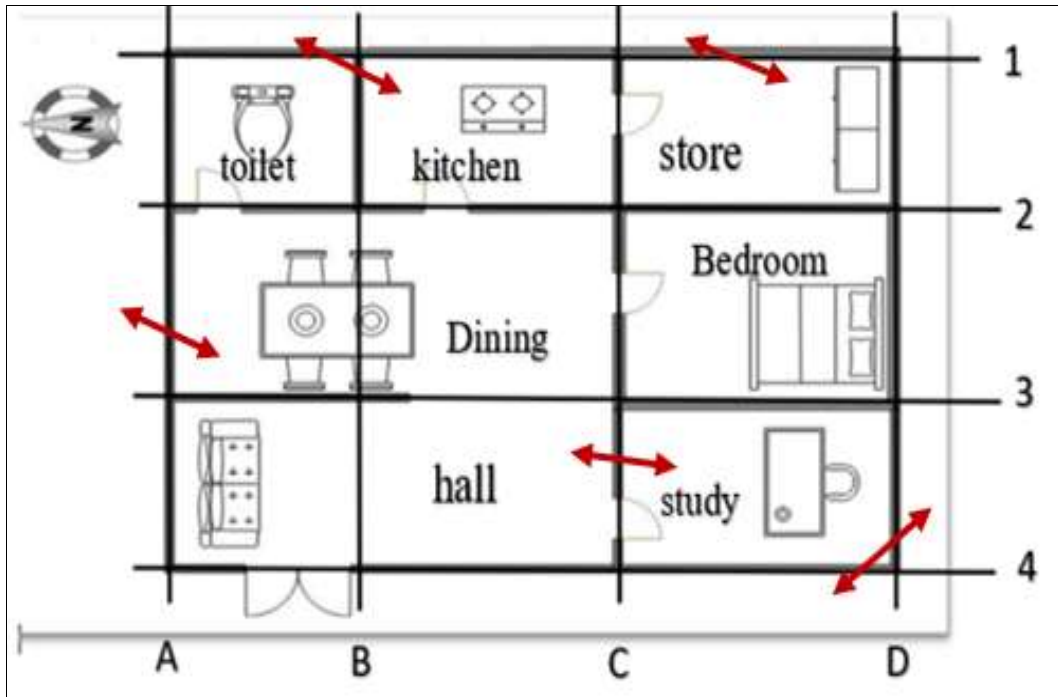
Plan with mark of distress in walls of Ground Floor in location L2
